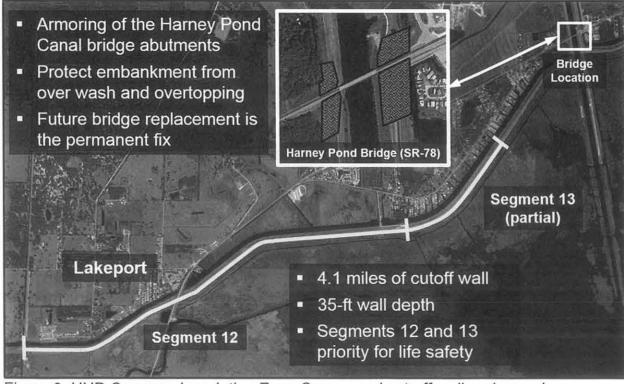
HHD Common Inundation Zone C proposed cut-off wall and armoring.
